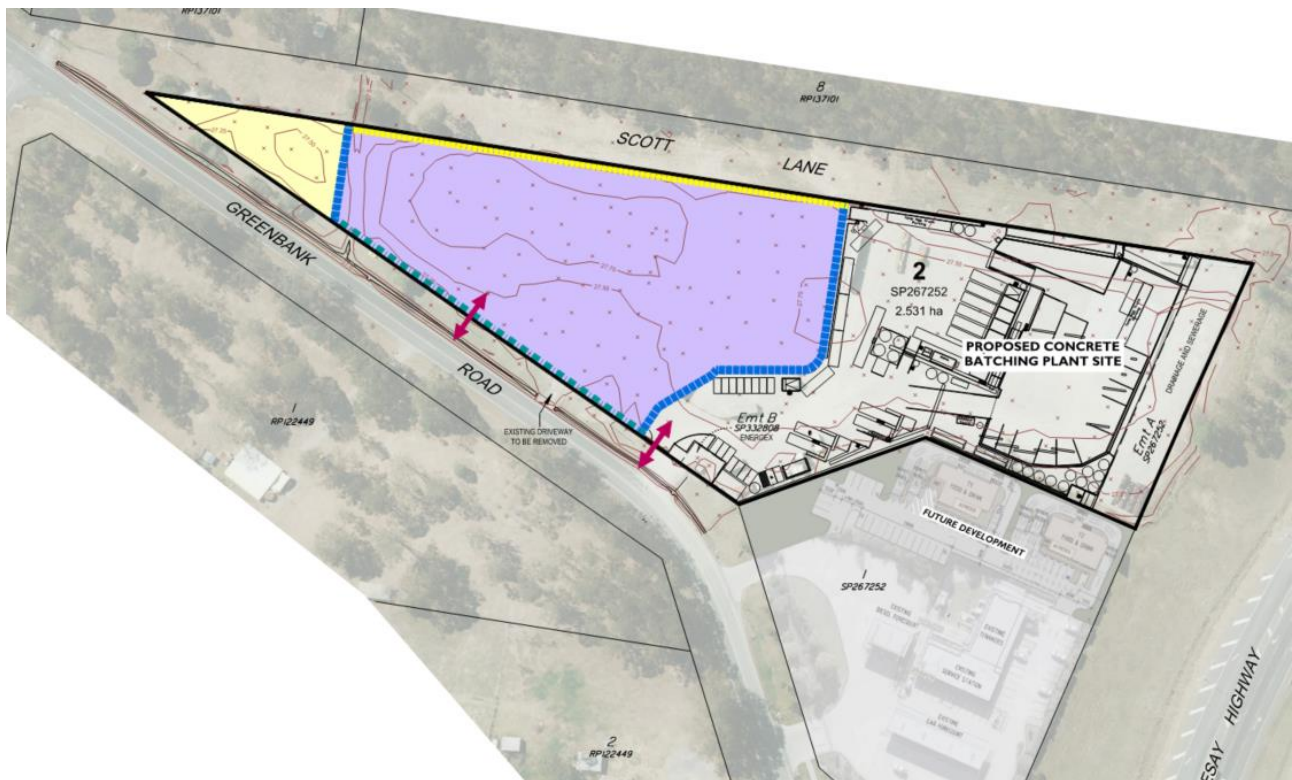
Concept Site & Services Layout Plan (Courtesy: RPS)
